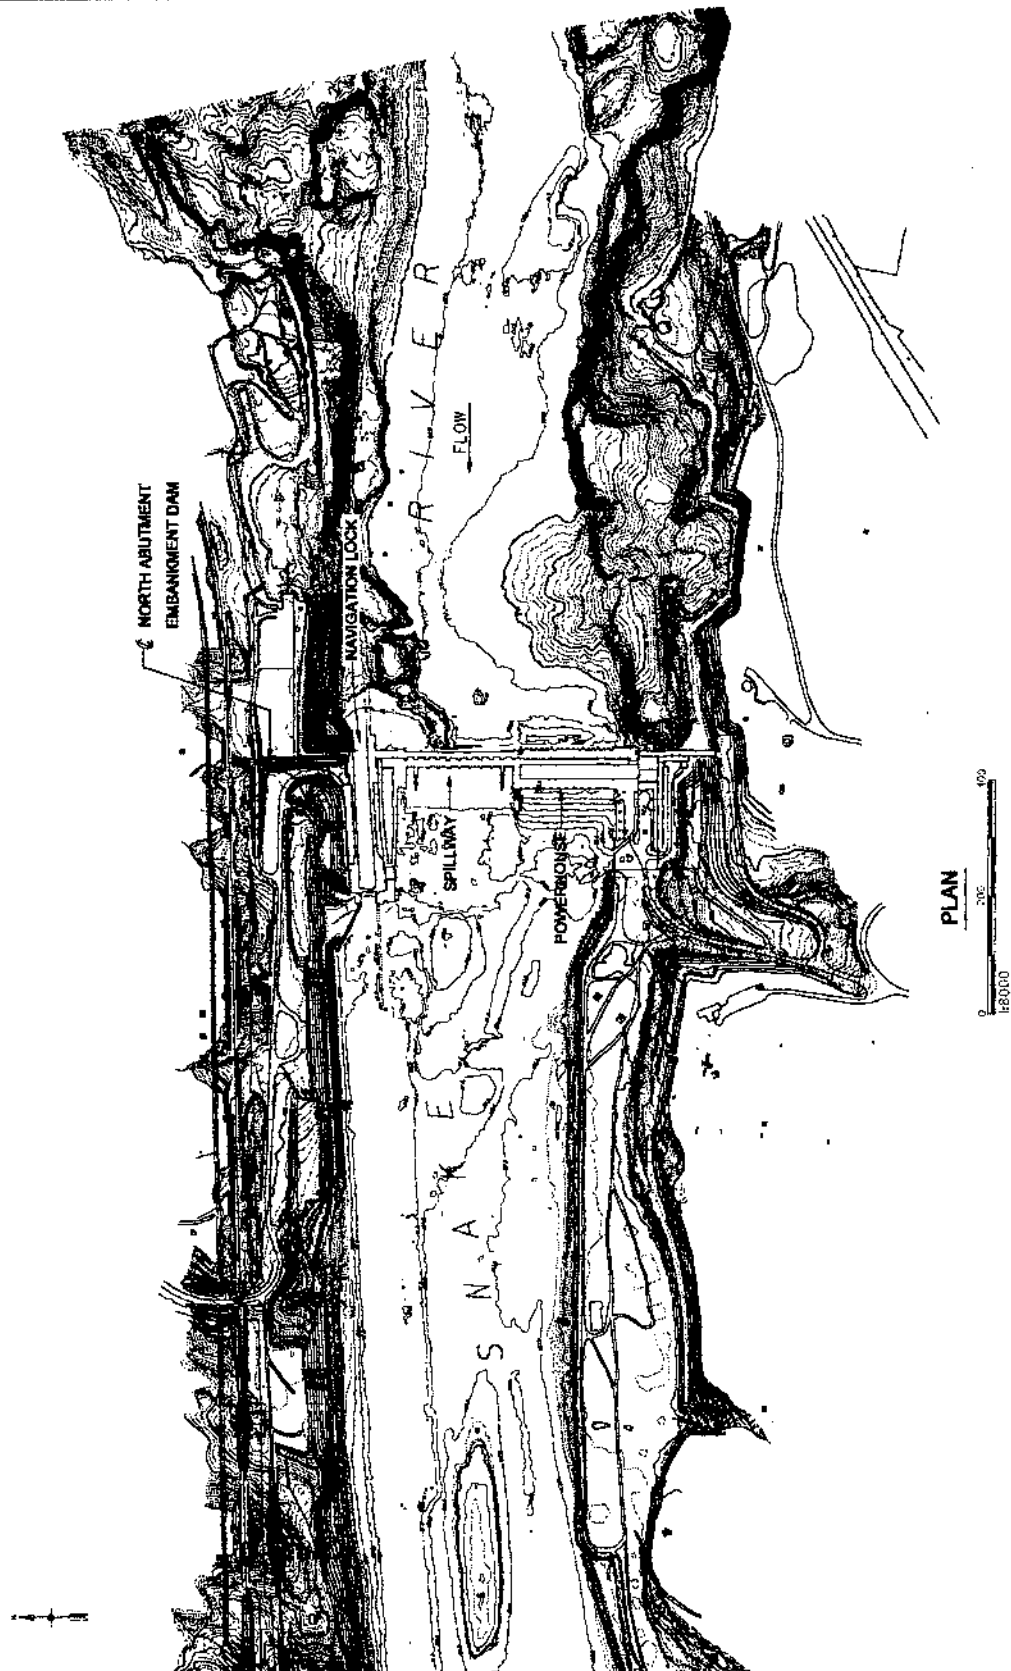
Ice Harbor – Existing Project Arrangement General Plan
